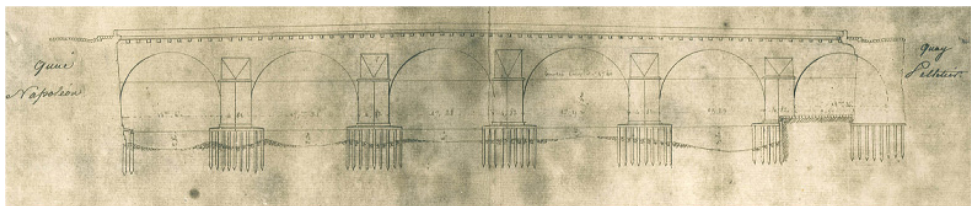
Pont Notre-Dame, Front of the Bridge, 1806
